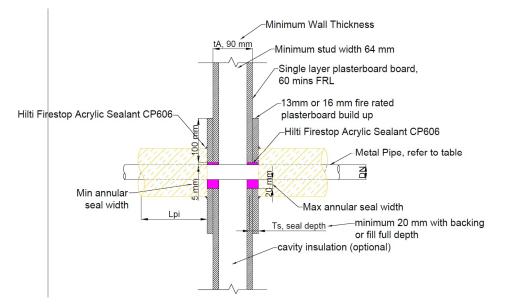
Insulated services penetrating -/60/60 and 60/60/60 framed walls
